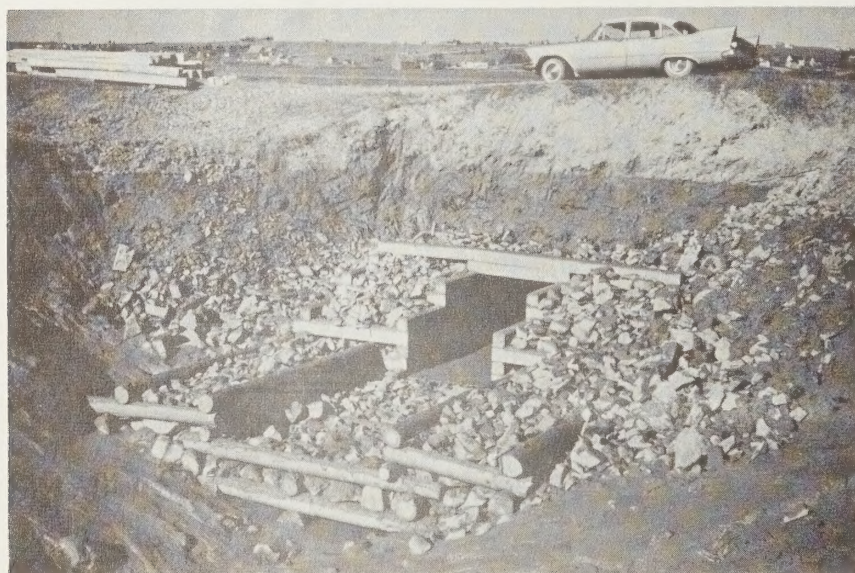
Memramcook West Marsh, Westmorland County, N.B. Typical small aboiteau with the rock crib outlet which was adopted to replace the earlier standard of plank wingwalls and spillway.
